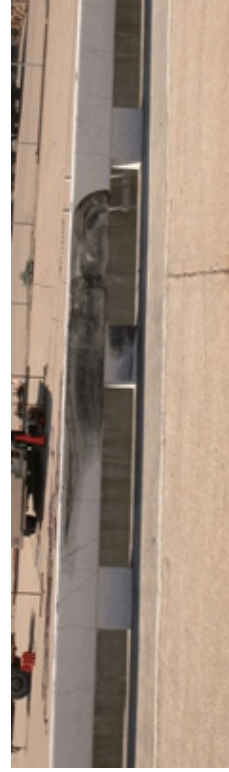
Open Concrete Bridge Rail System Damage, Test NIT-1
